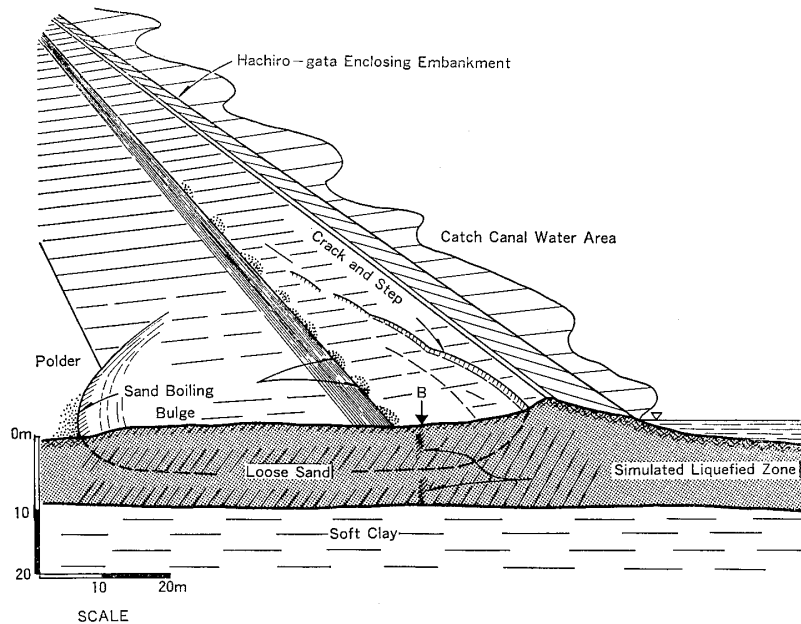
Slope failure of the Hachiro-gata enclosing embankment at Site B
